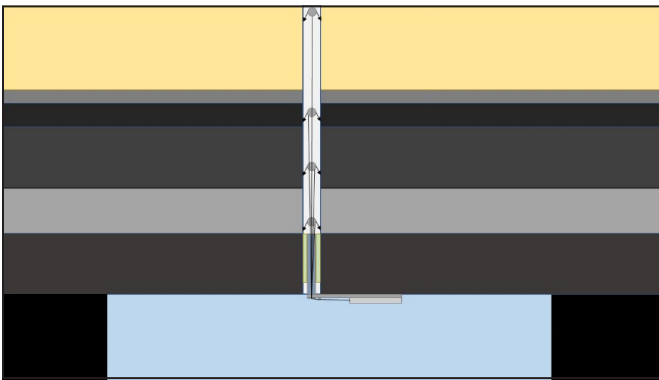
Cross-section view of an installed 4-point roof extensometer depicting anchor horizons in the roof
